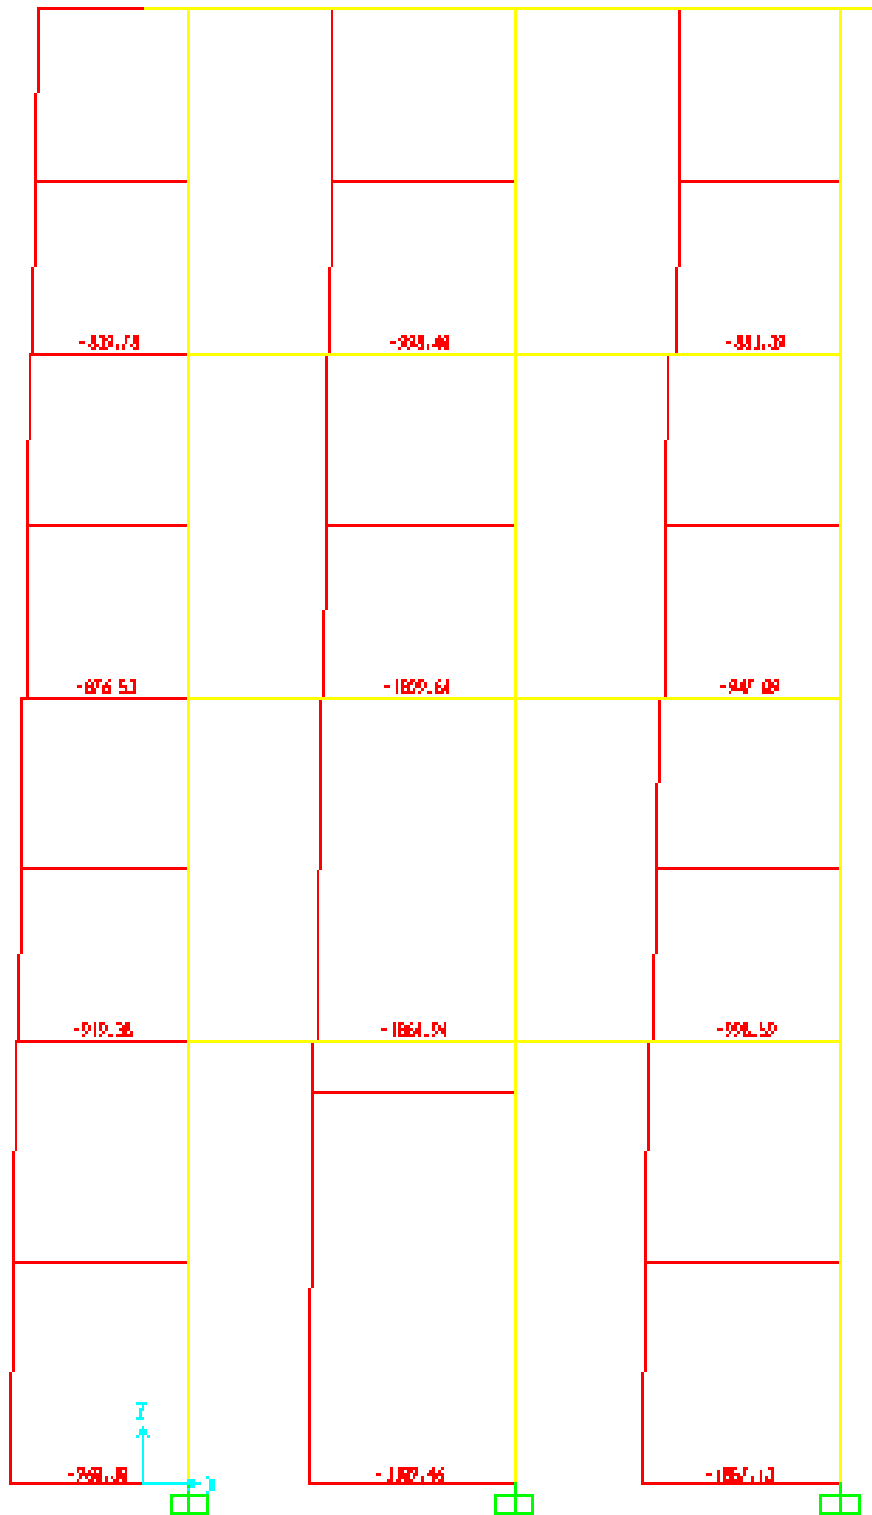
Rectangular water tank - columns axial load due to Combination (6)
